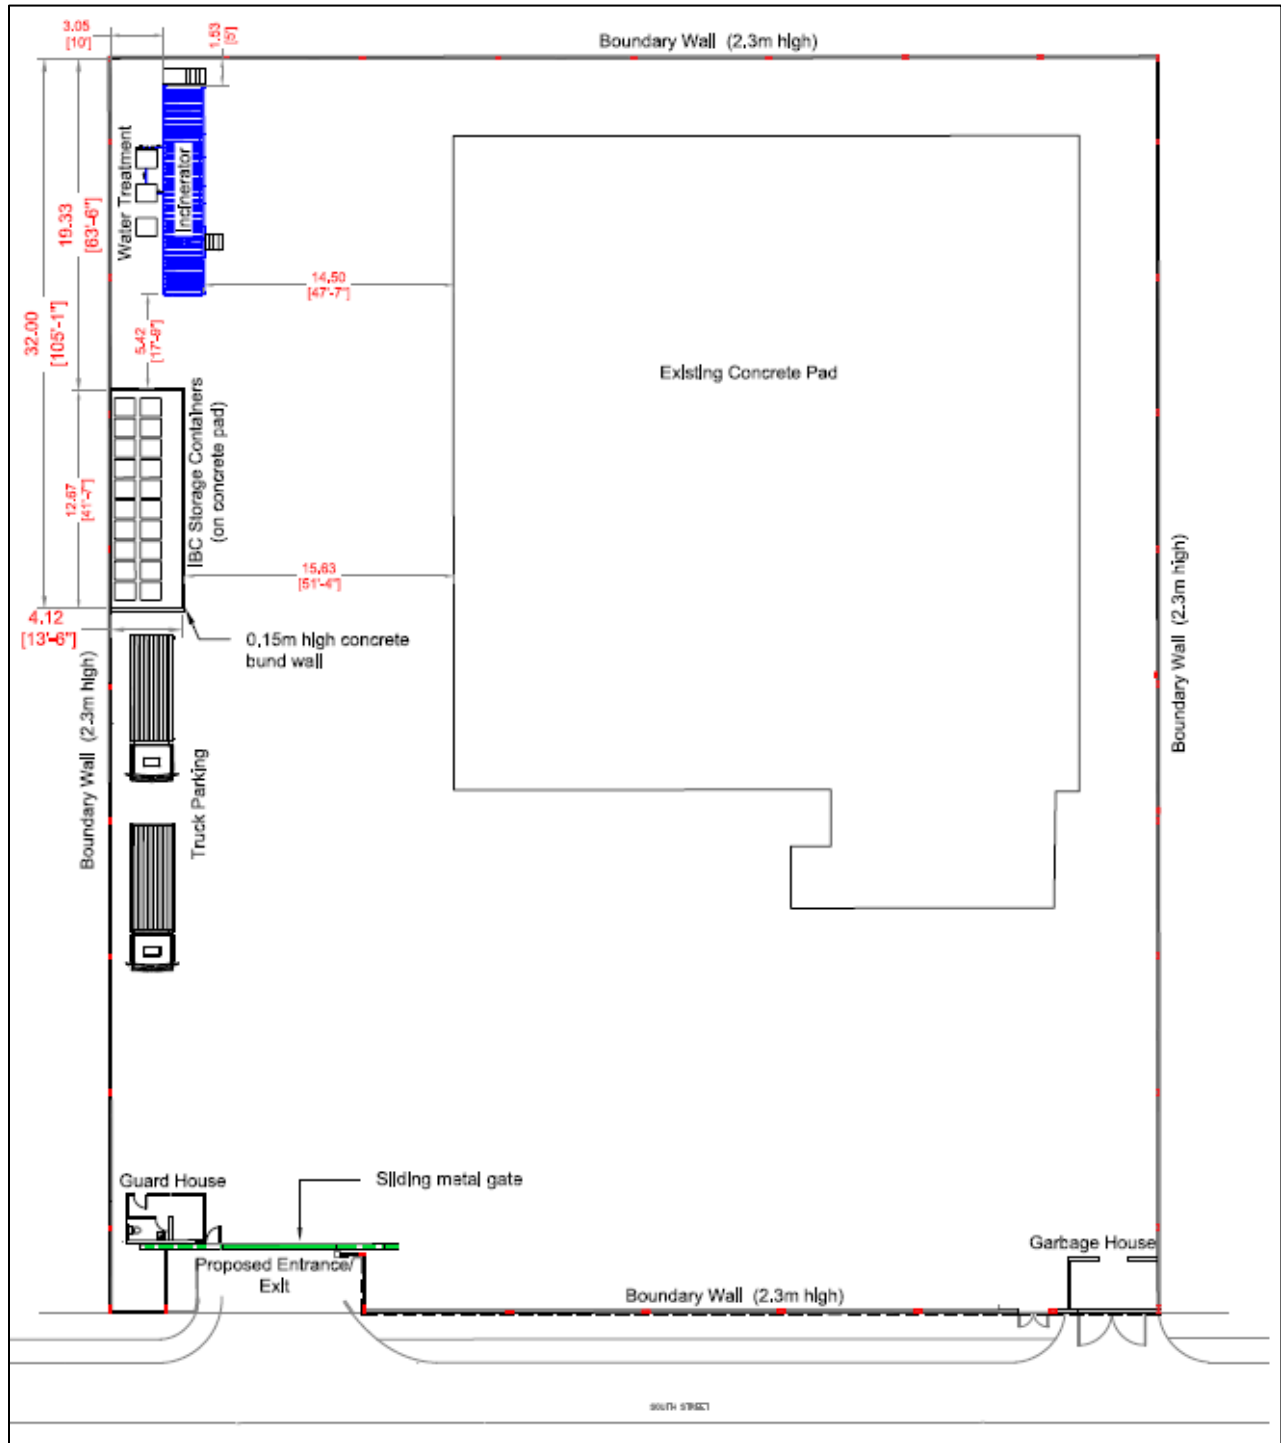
Site Plan for Lot 31 Ferry Pen
